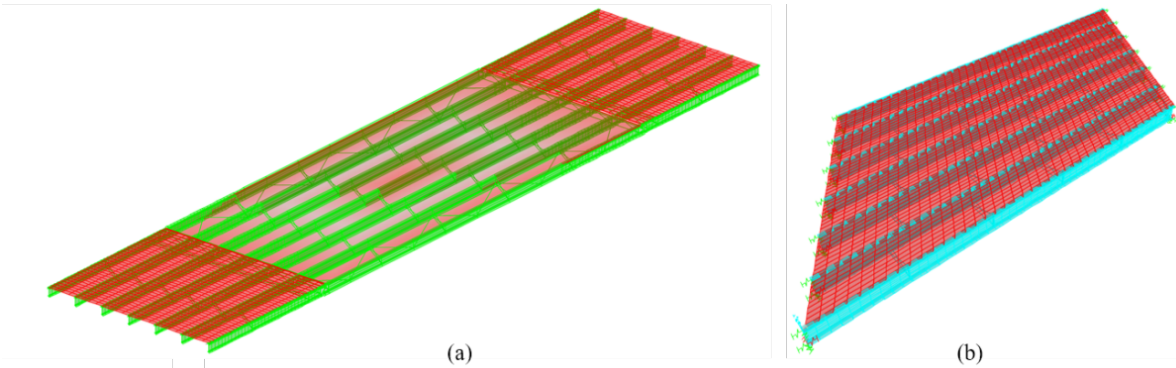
Finite element models of the (a) Telegraph Road Bridge and (b) Newburg Road Bridge.
